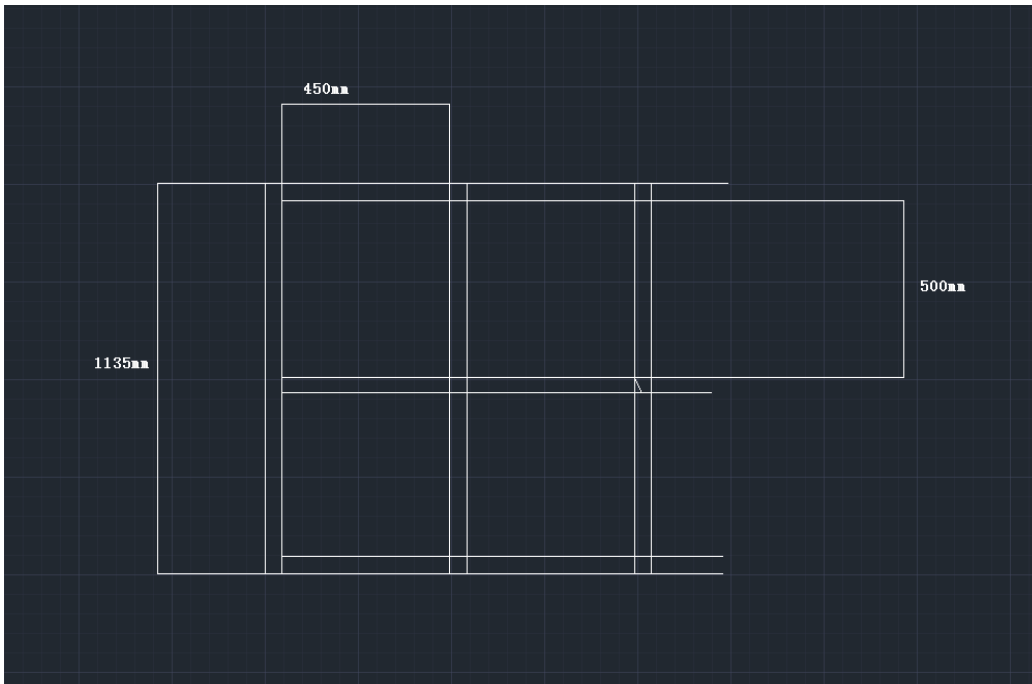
Plan view of the spandrel girder for one side of the room
